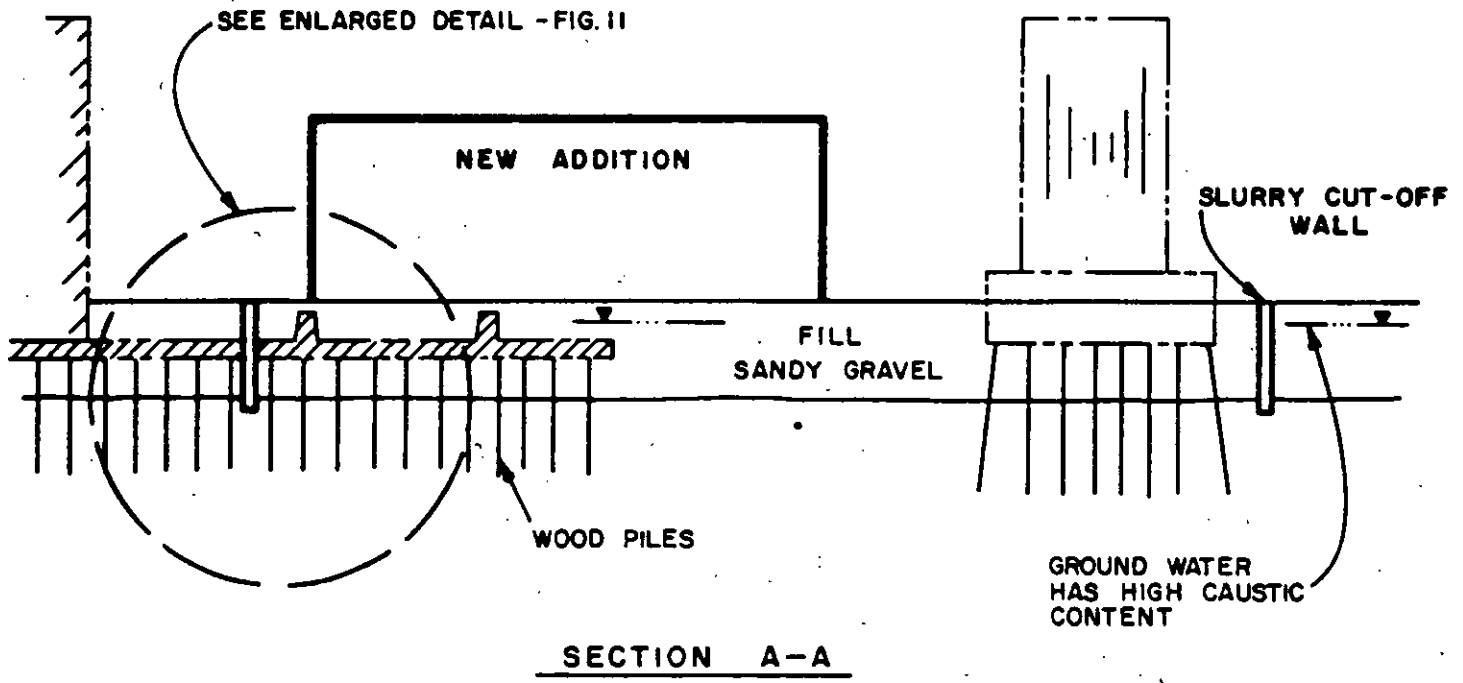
SECTION THROUGH SITE TO BE DEWATERED
